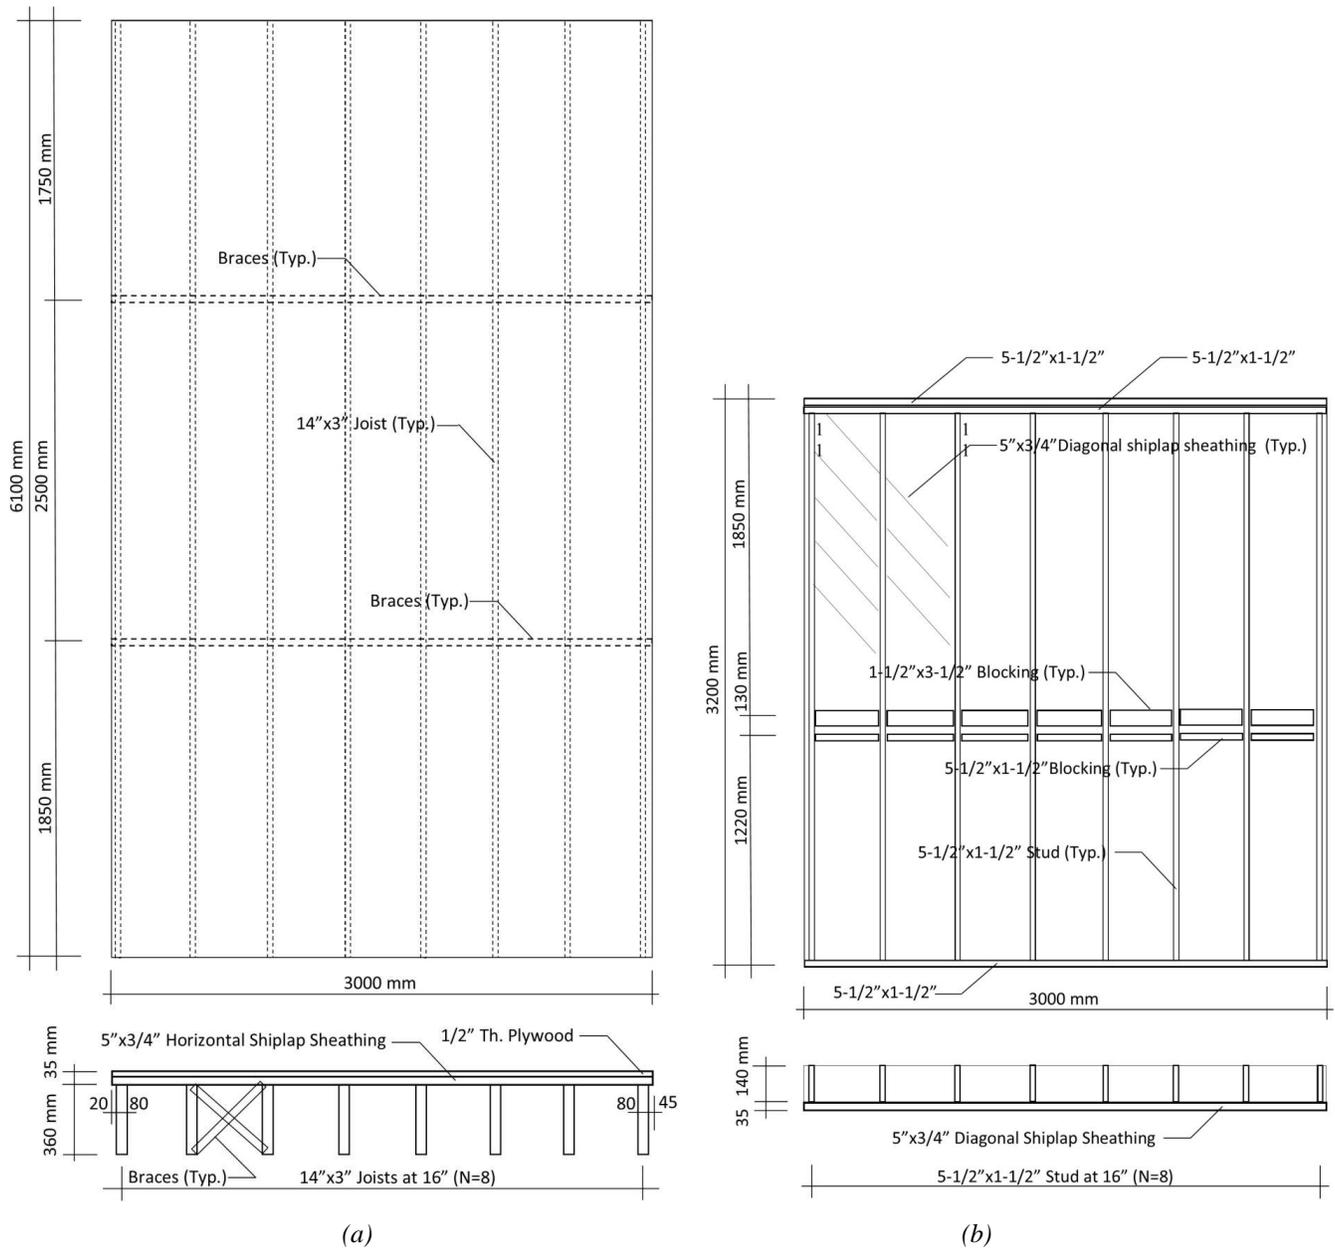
Schematic plan and section view of: (a) Roof deck specimen, (b) Shear wall specimen.
